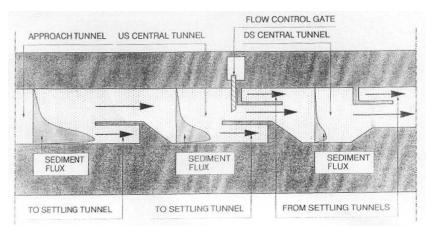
Longitudinal section through the central tunnel of Basic Split and settle arrangement, from H. Støle, Sept 2004
